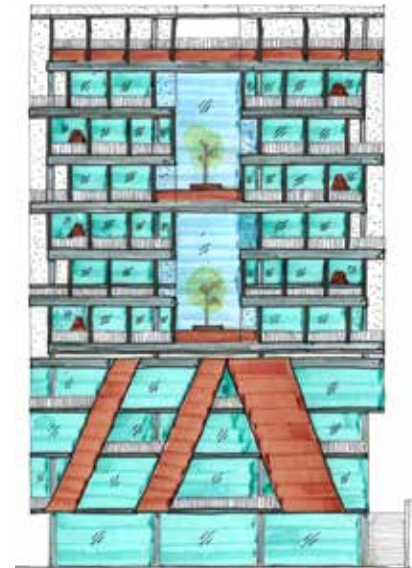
Design 1 - Evolution - North facade elevation
